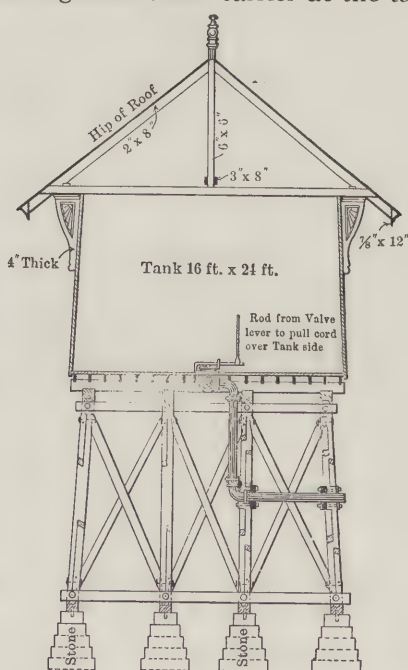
SECTION OF SUPPORTING FRAME AND TANK, LOOKING FROM POSITION A OF LINE A-B, FIG. 86
